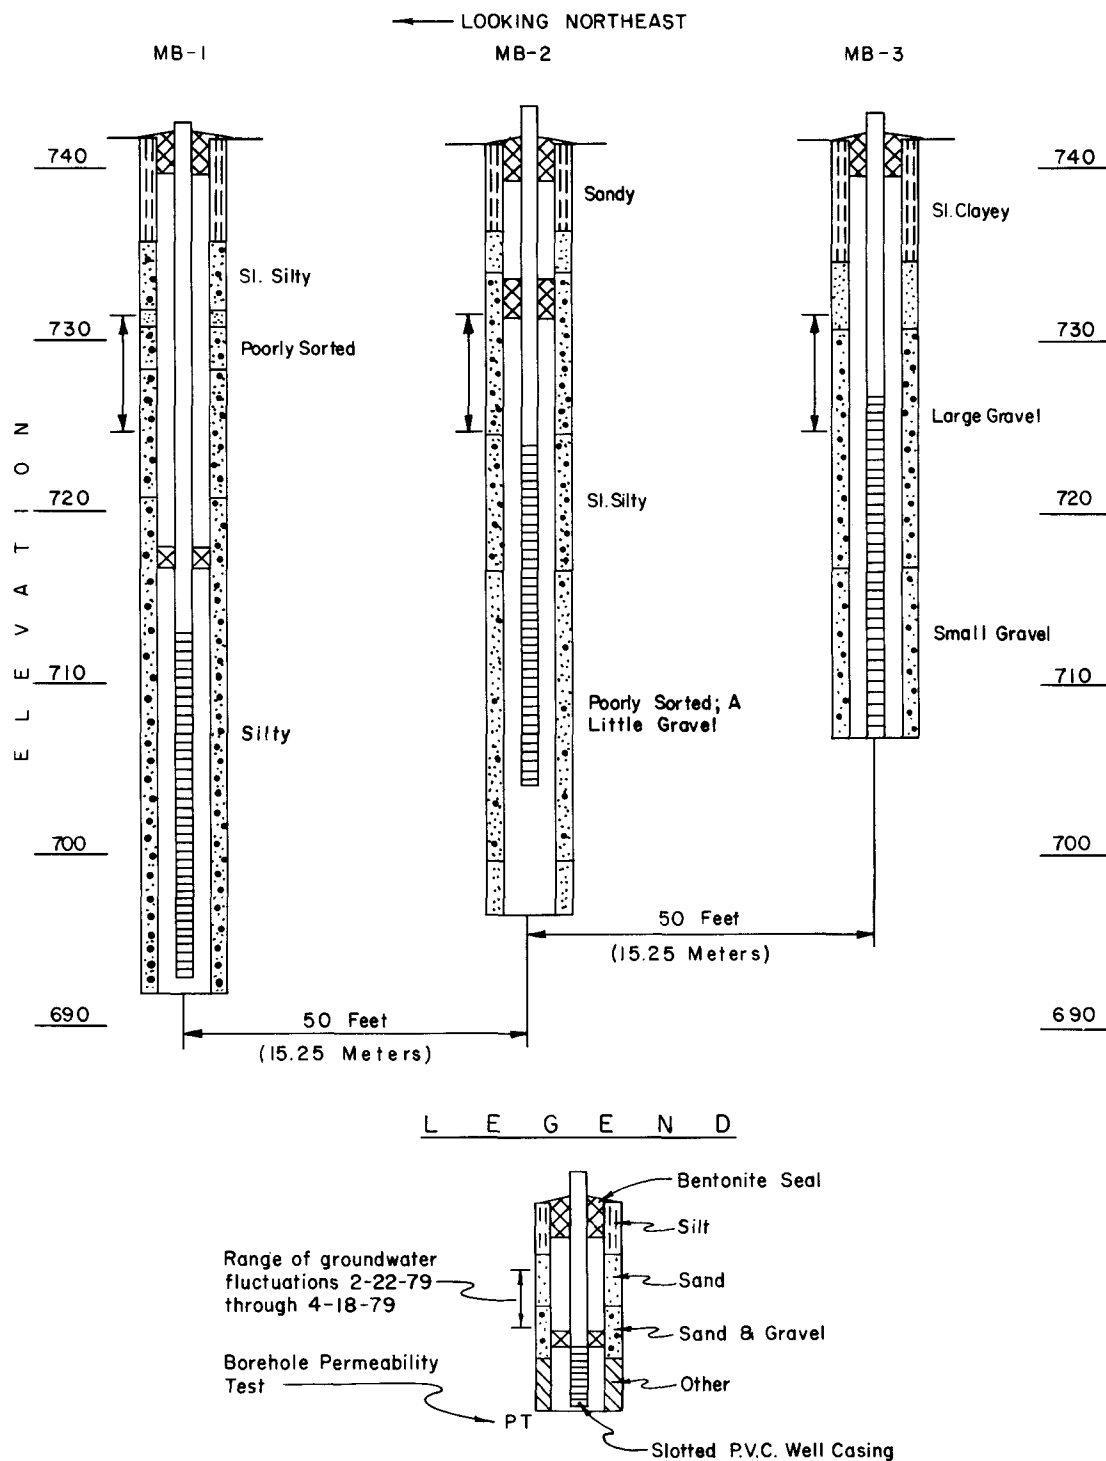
Installation Details - Monitoring Well MB-1, Observation Wells MB-2 and MB-3
